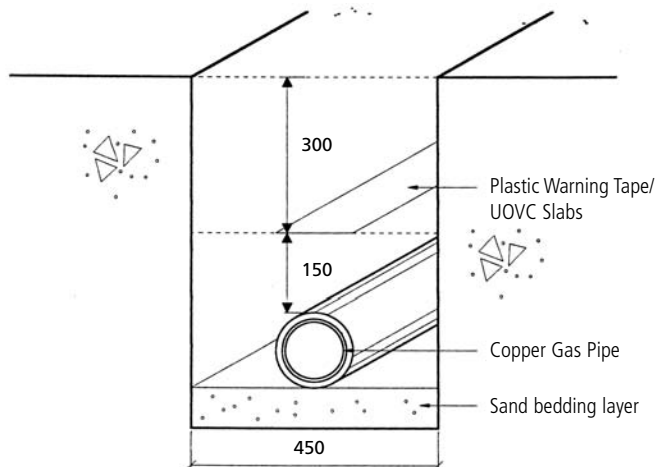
PIPING BURIED IN GROUND OR UNDER CONCRETE EXTERNAL OF BUILDING IN NON-TRAFFIC AREA
